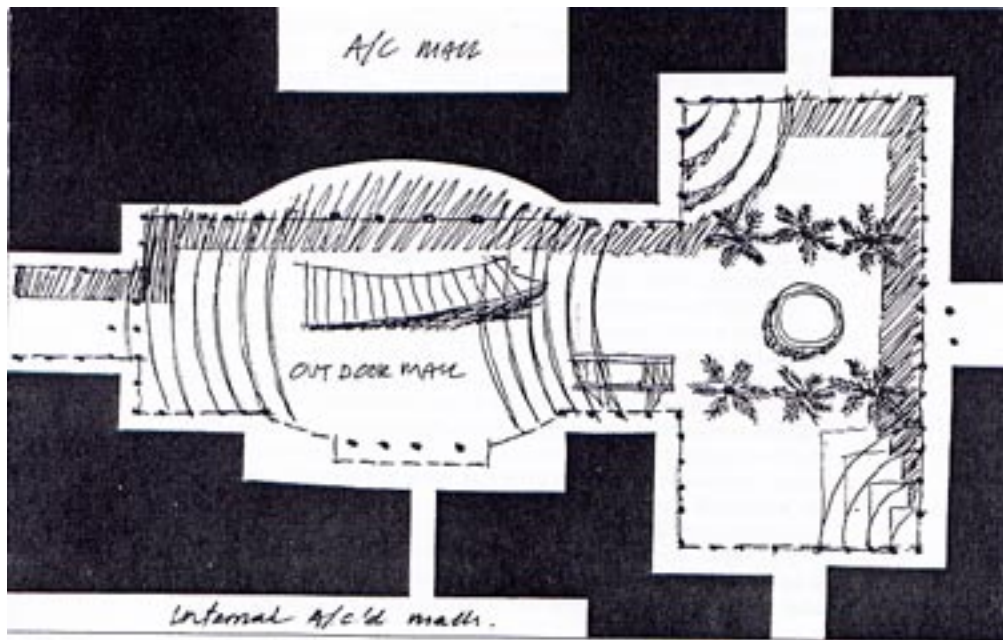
Typical ground floor plan with civic facilities and covered outdoor spaces.
